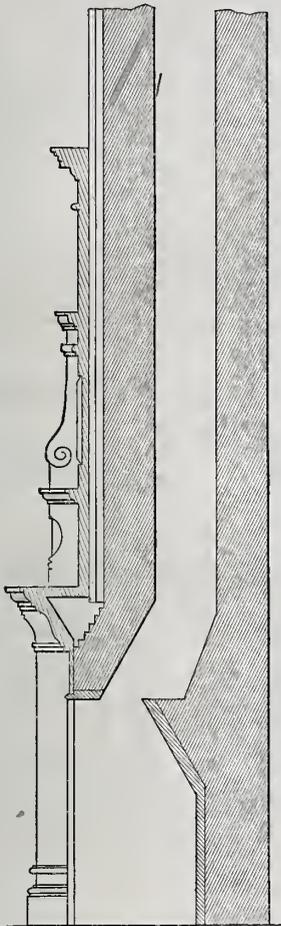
Section through Mantel.—Scale, 1/2 Inch to the Foot.
